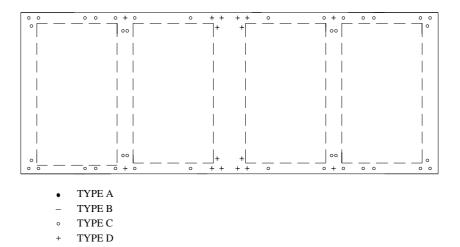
Location of Anchor Dowels in Specimen SP-6
